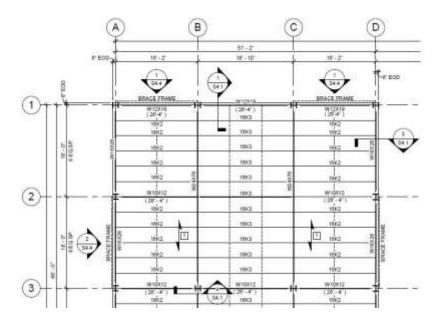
Typical Floor Framing Plan (Enlarged) (Image Credit: Larson Design Group)
